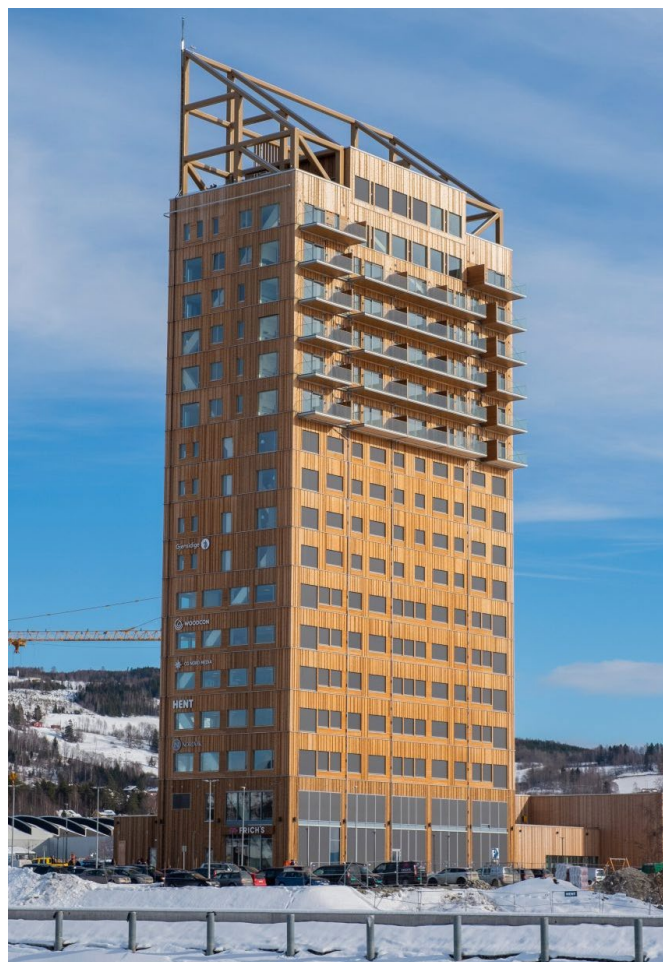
Example of Glulam and CLT use in high-rise construction (Mjøstårnet building, Norway — 85 m height)
